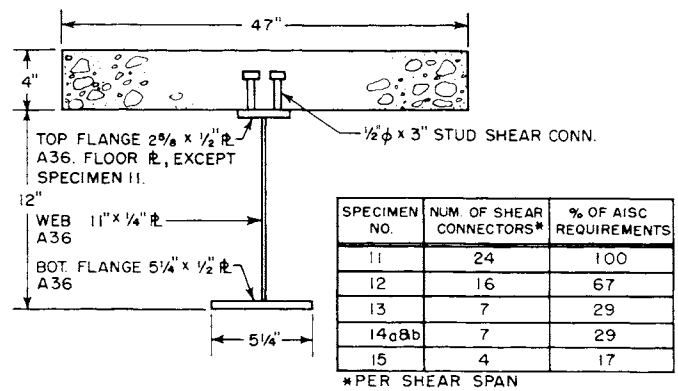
DESIGN DETAILS OF SERIES I SPECIMENS
